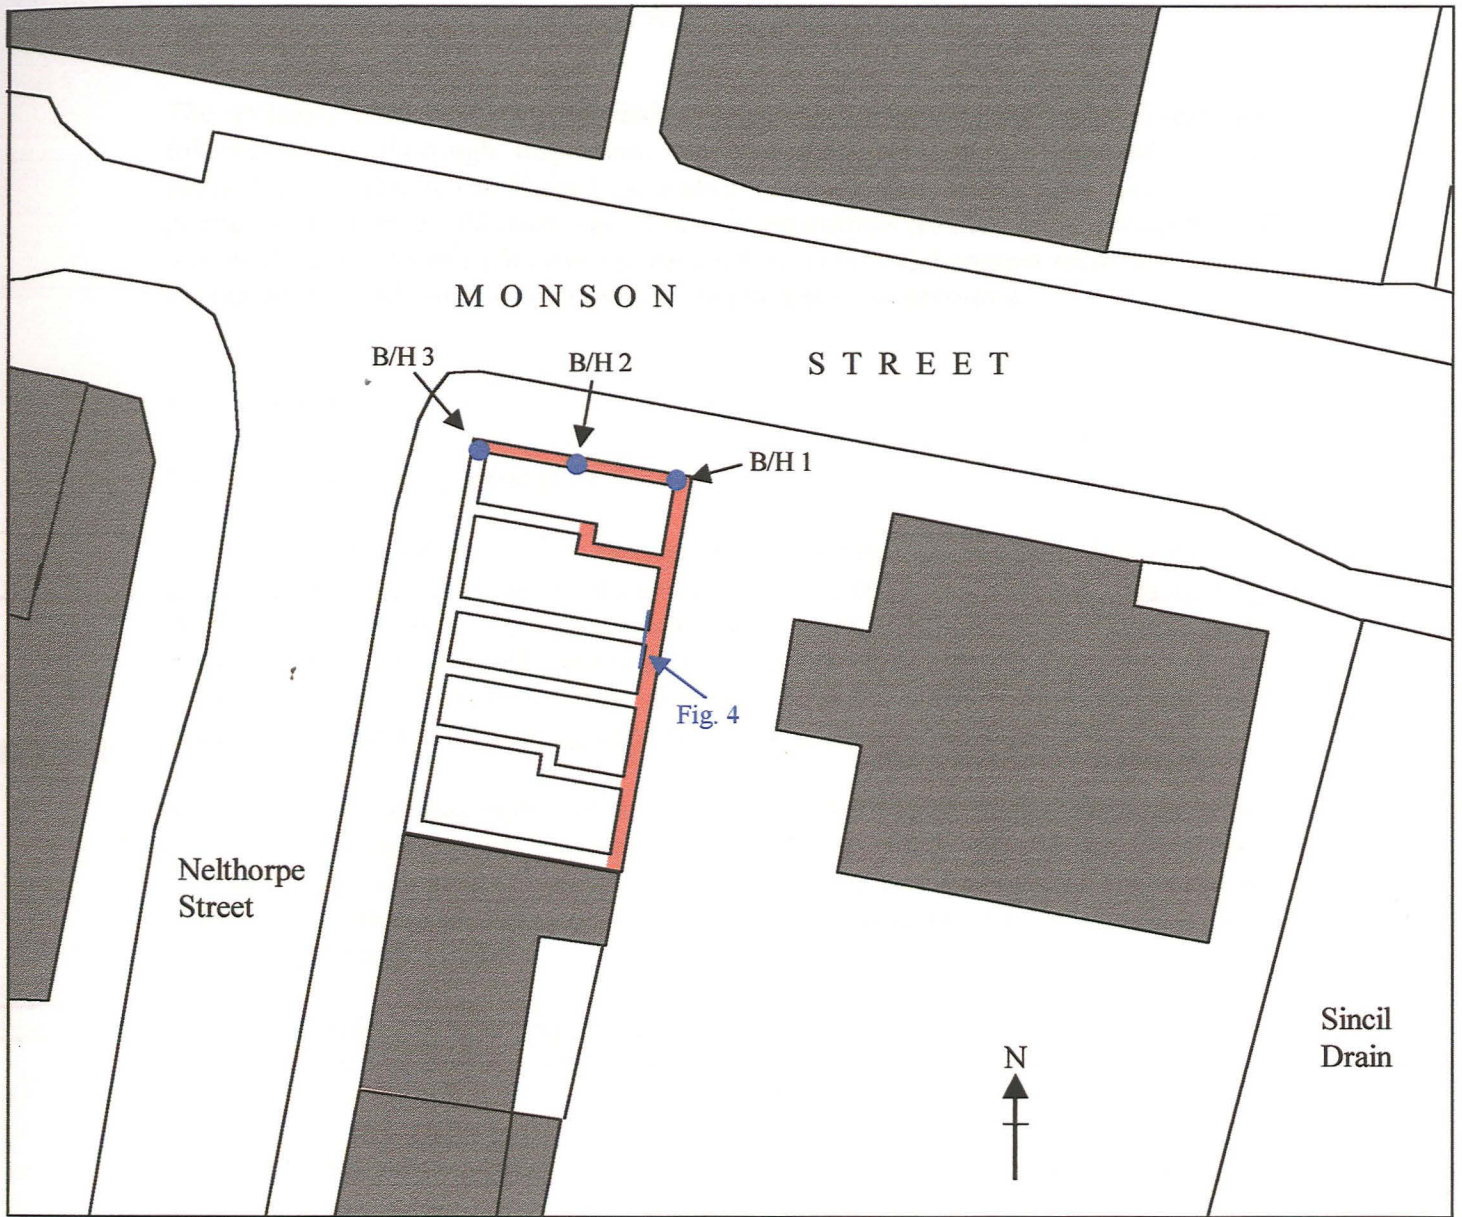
Plan showing the foundation trenches for the new development and the positions of the auger holes. The area shaded red shows the trenches excavated before the foundation strategy changed. Scale 1:250
